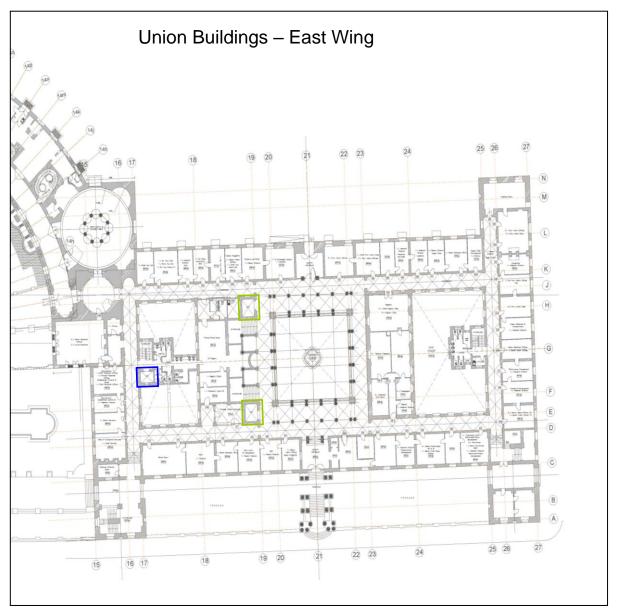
\_Union Buildings\_Ground floor plan\_Location of existing Lifts\_East Wing (Source: Drawing Ikemeleng Architects, 2017)
